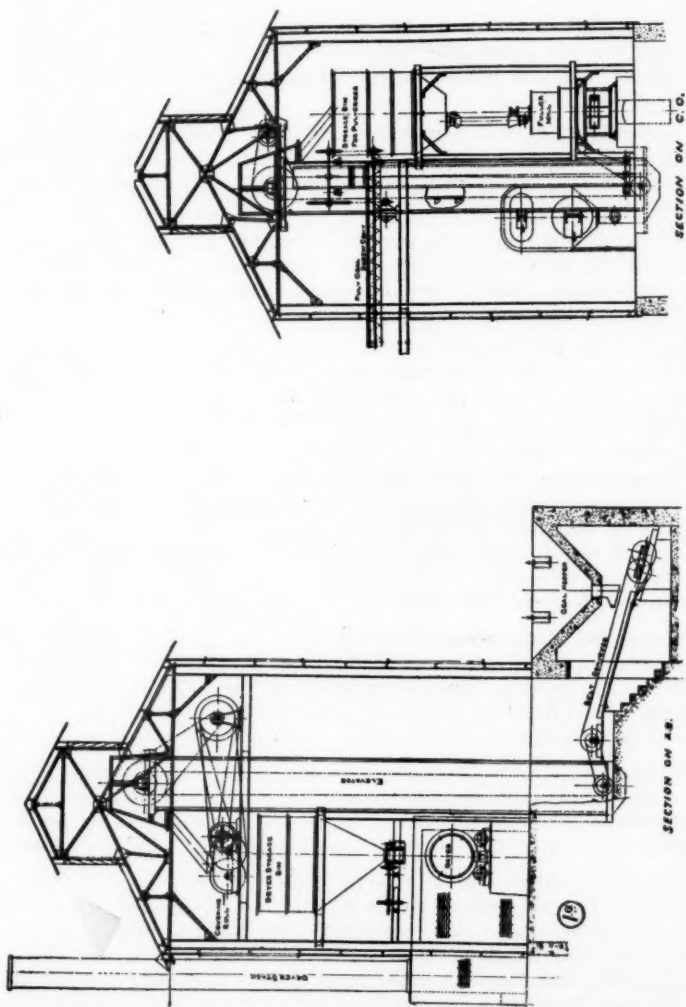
A. SECTIONS OF PULVERIZING PLANT SHOWN IN FIG. 10.
